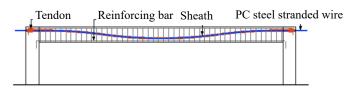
Arrangement of PT tendon in prestressed concrete beam²⁾
